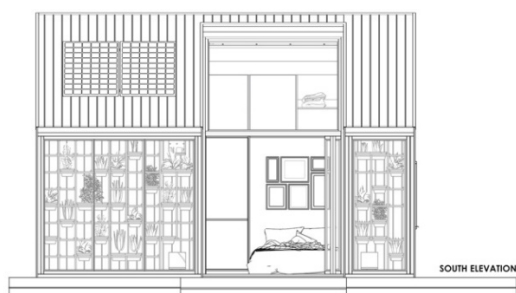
The house south façade showing the integrated design of the hybrid Trombe wall and the green wall as passive systems.
